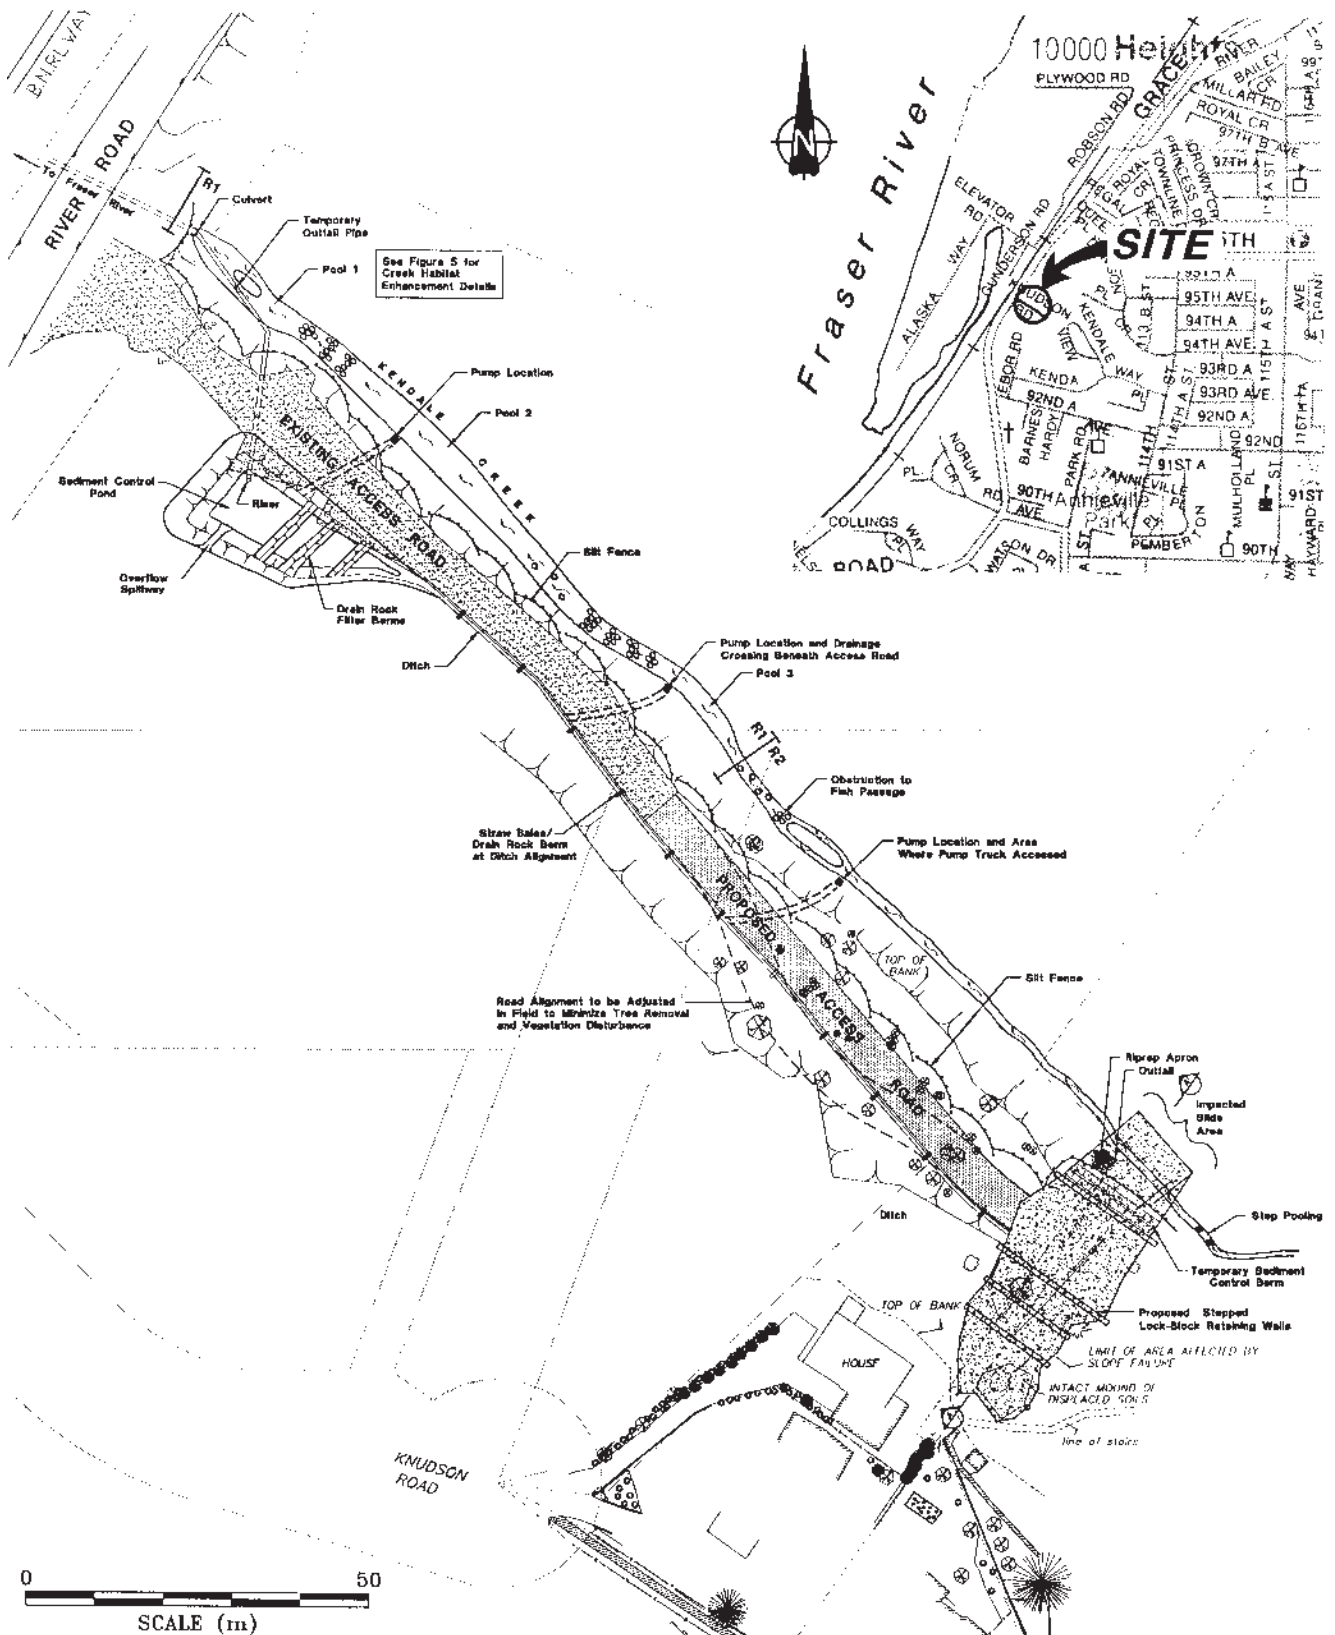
Location and plan of slope failure, access road and characteristics of Kendale Creek in North Delta before site rehabilitation.
